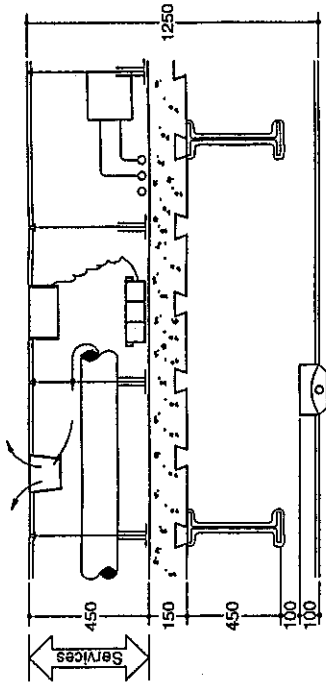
Secondary distribution in floor: false floor depth increased, services removed from ceiling, zone-transferred to floor zone. (Source: J. Berry, Ove Arup and Partners.)
